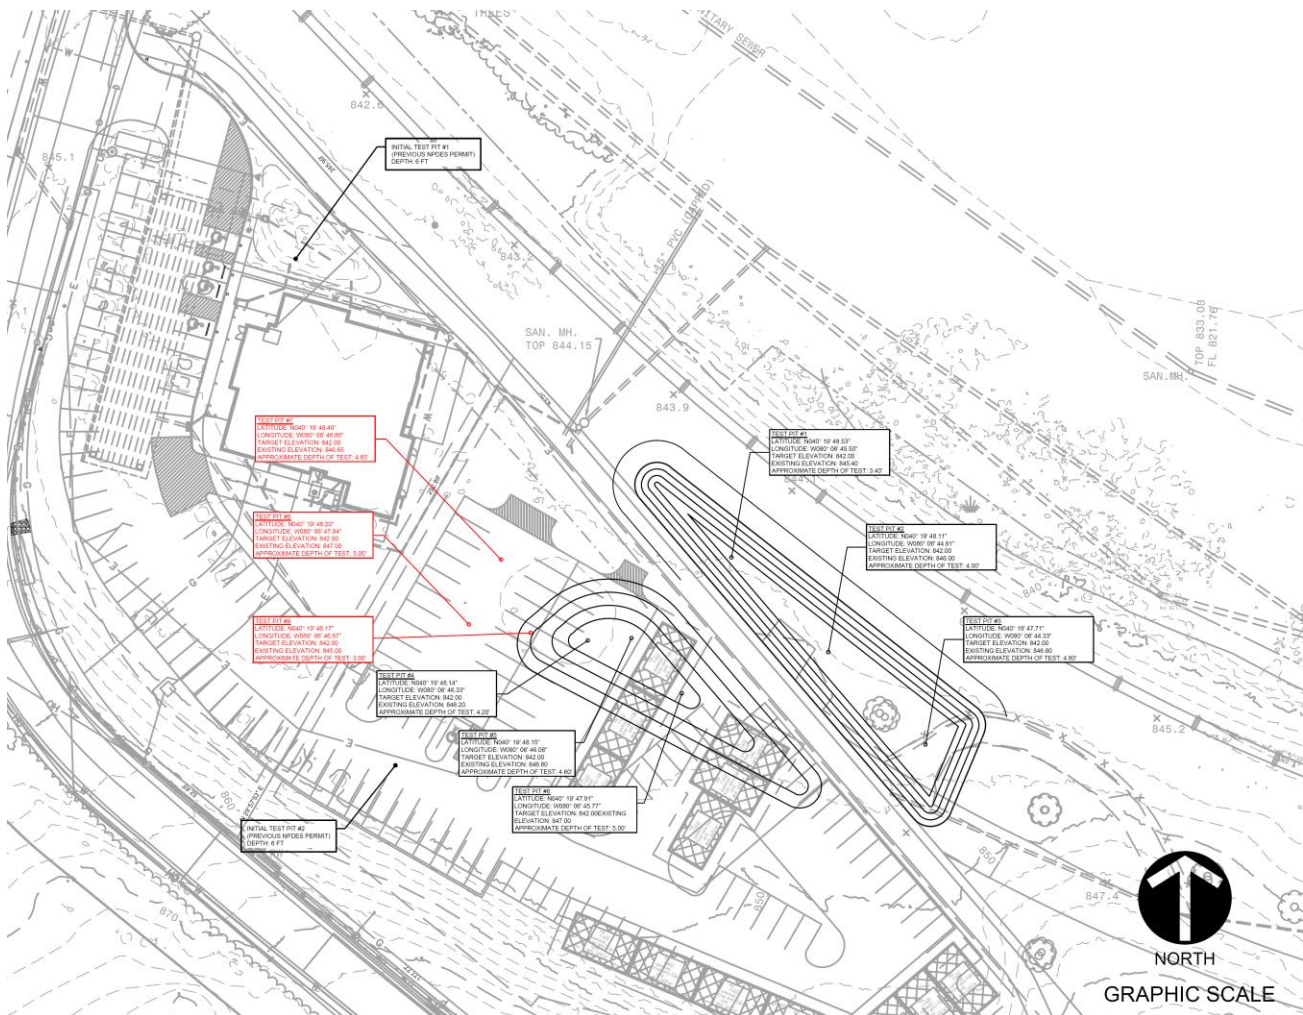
Infiltration Testing Plan – OTB Alternate Area
